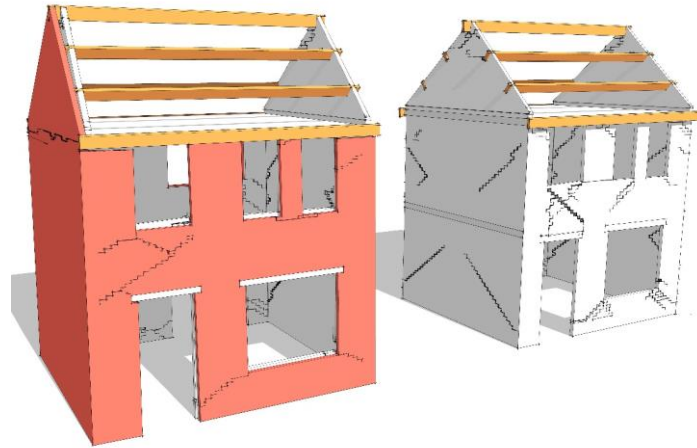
EUC-BUILD1: shake-table test specimen and corresponding damage pattern at end of testing on both outer-leaf clay walls and inner-leaf calcium-silicate walls (Graziotti et al. 2015, 2017)
